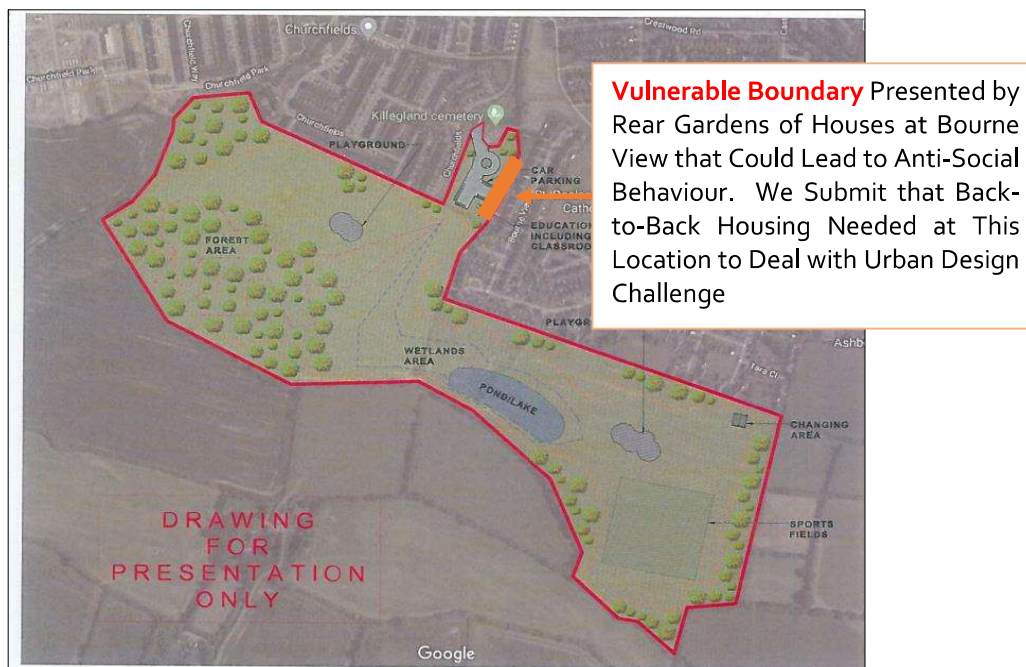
Site Layout Plan of Proposed Park, as annotated by Thornton O'Connor Town Planning to Show the Area with No Passive Surveillance
